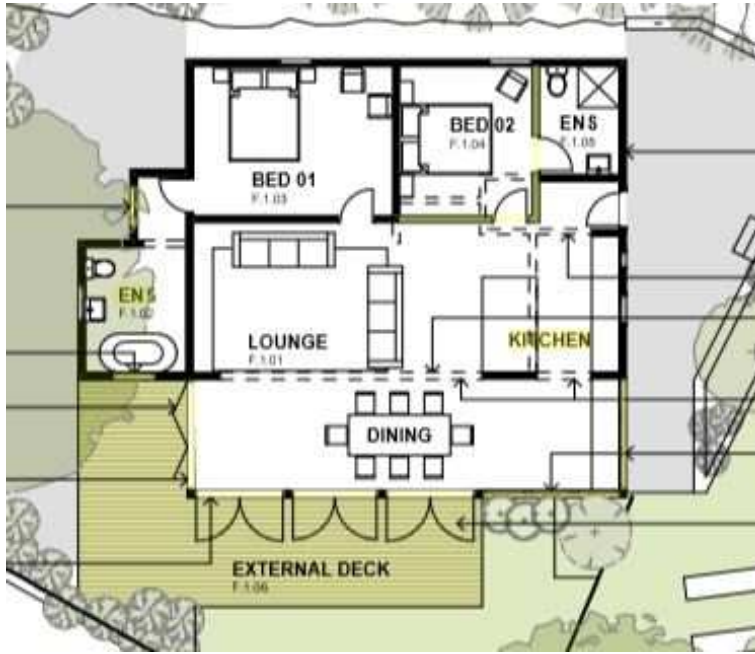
33 Green Point Cottage Proposed Floor Plan
